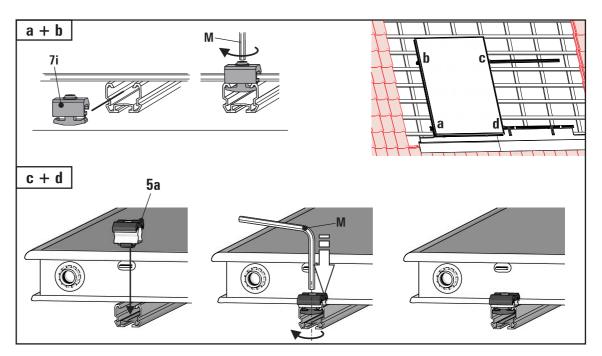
Screw flat solar panel with individual single clamping blocks (7i) on the mounting profile rails and insert double clamping blocks (5a).
